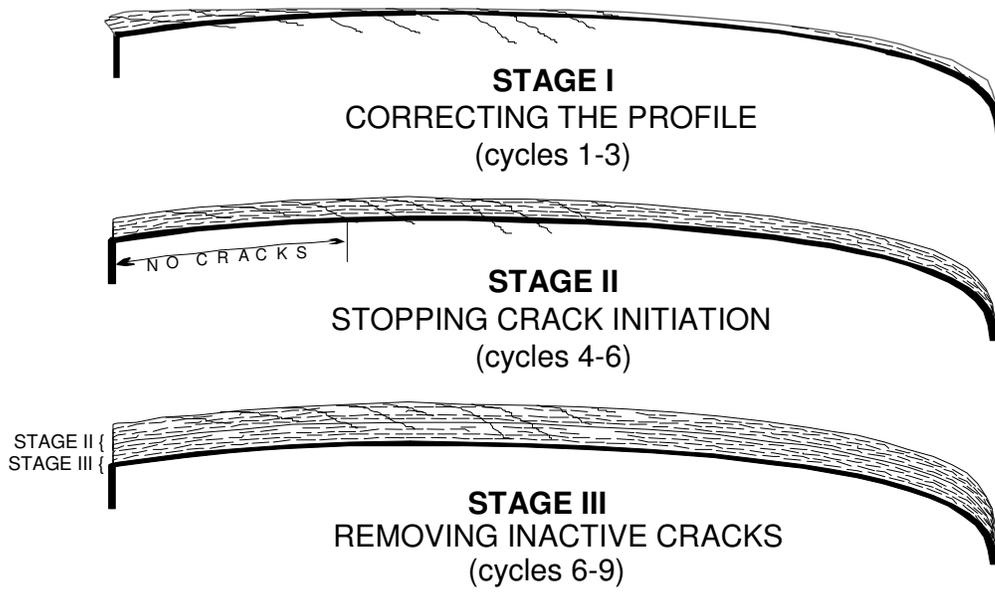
Staged profiling and crack elimination with the preventive-gradual strategy.
